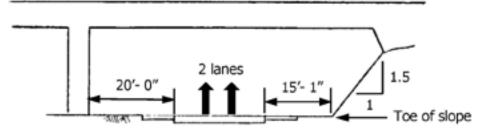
Bridge elevation view of horizontal clearances for a 2-lane highway with 1-way traffic below the bridge.
